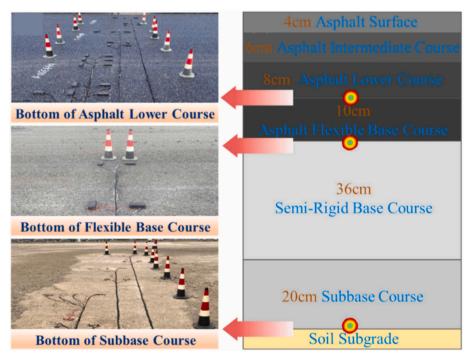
On-site sensors installed in various layers of pavement and illustration of pavement structural layers [125].
